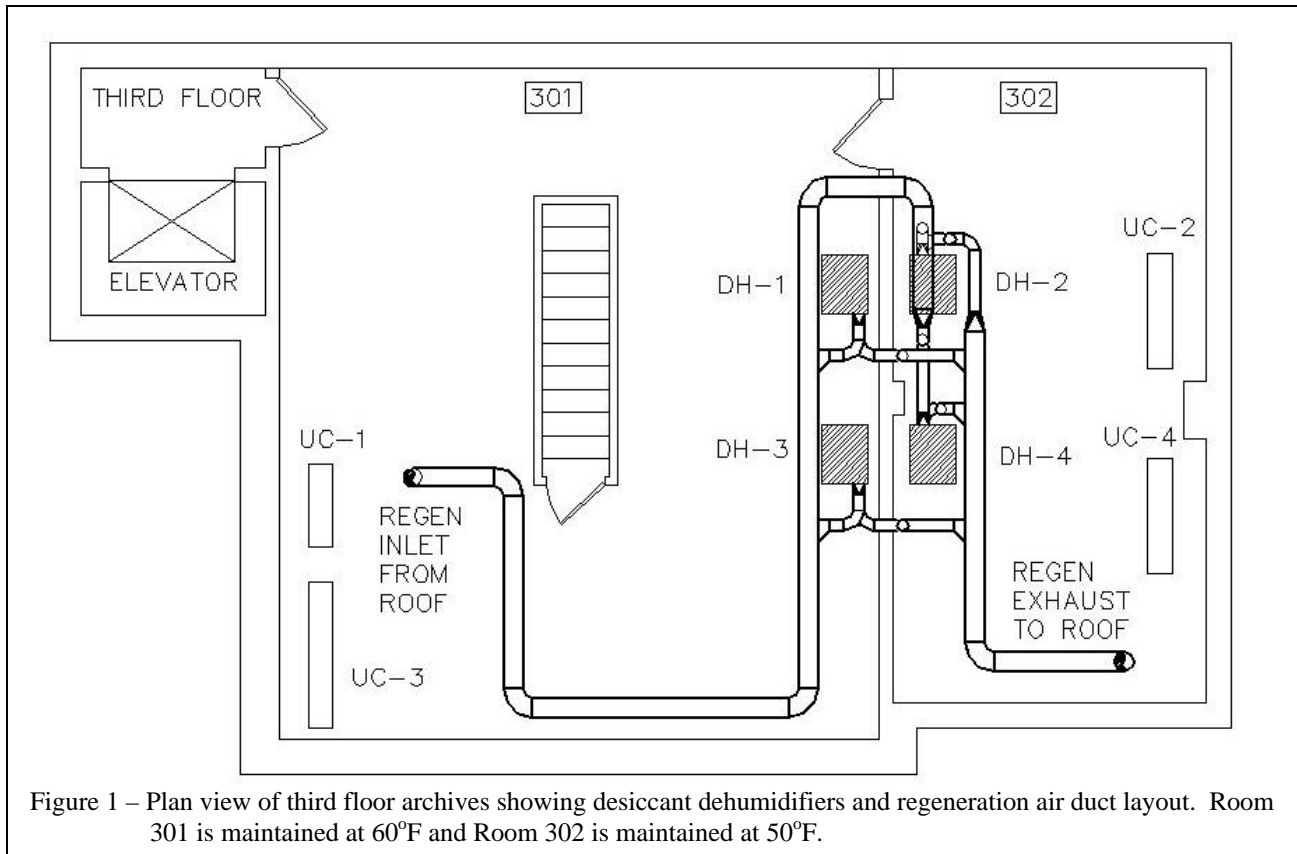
Plan view of third floor archives showing desiccant dehumidifiers and regeneration air duct layout. Room 301 is maintained at 60°F and Room 302 is maintained at 50°F.
